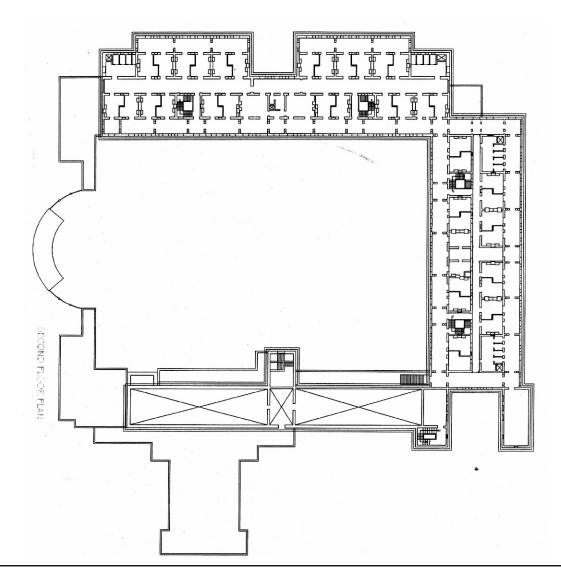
(i): Layout plan of MH Hostel Old Block: Second Floor
